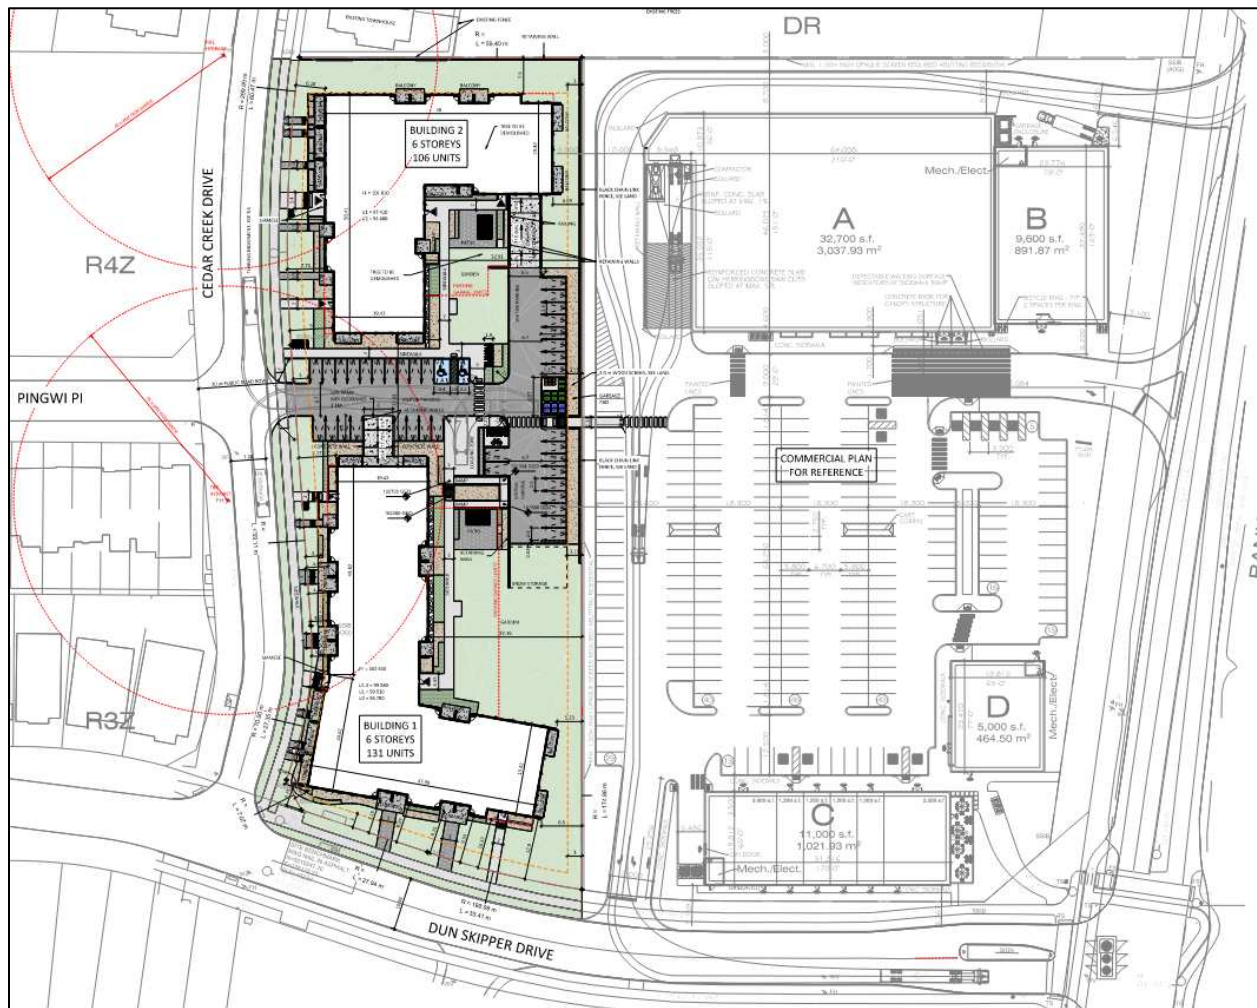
Excerpt of Site Plan by PMA Architects (full version enclosed)
